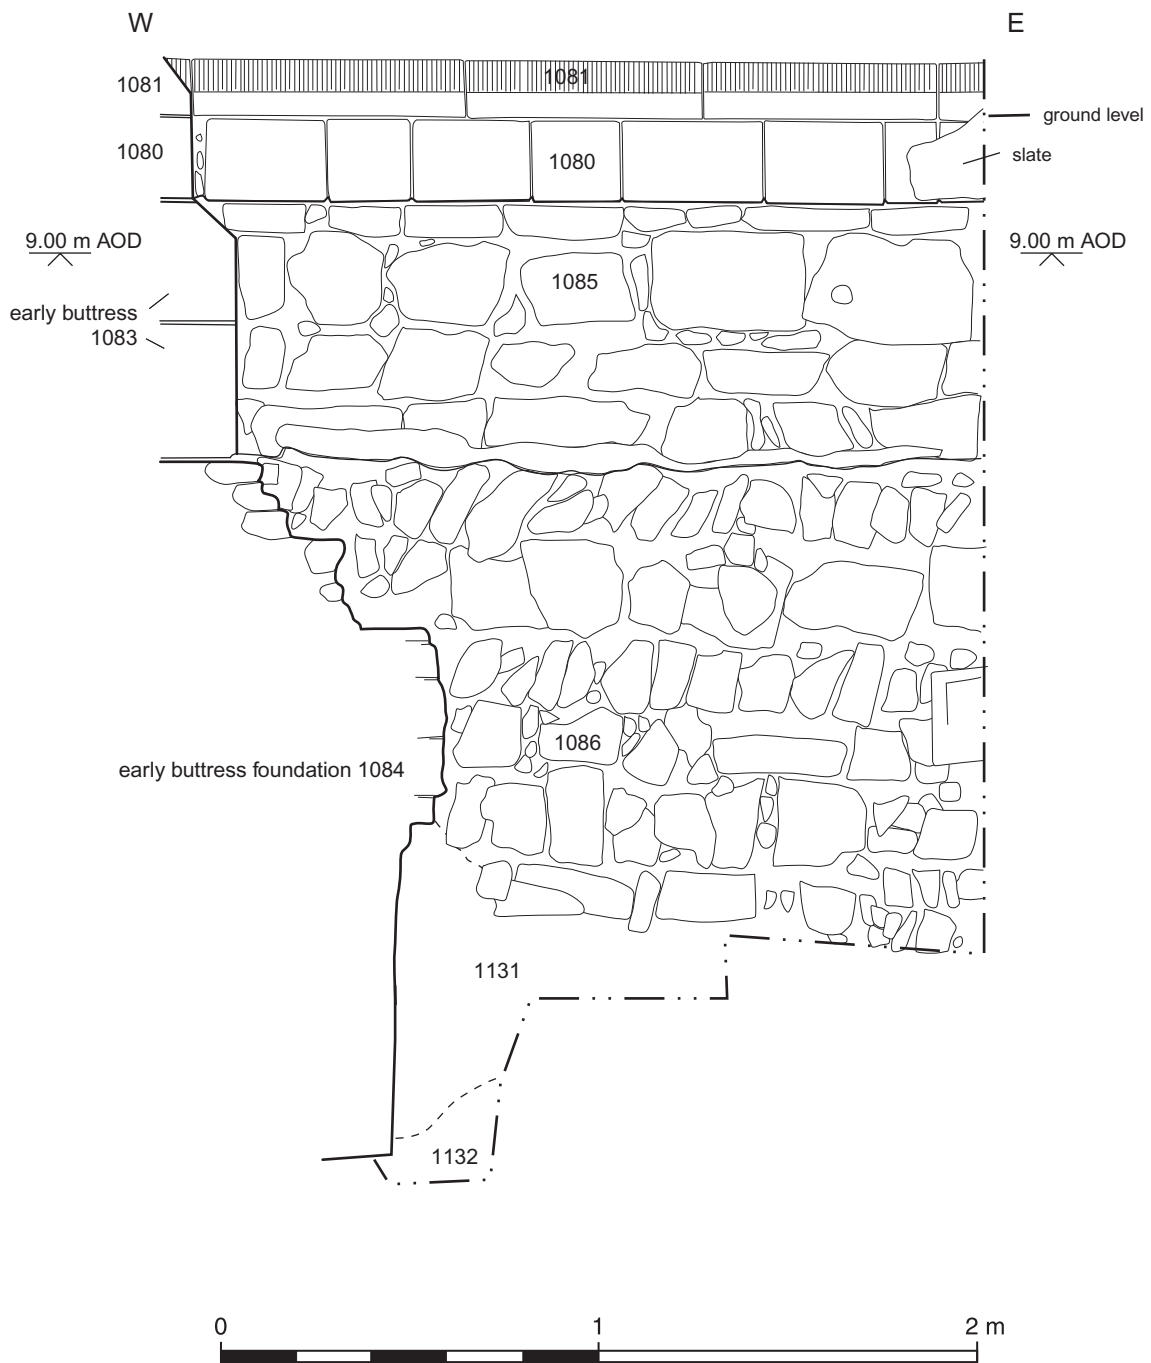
Trench 1, south-facing elevation. Scale 1:20
